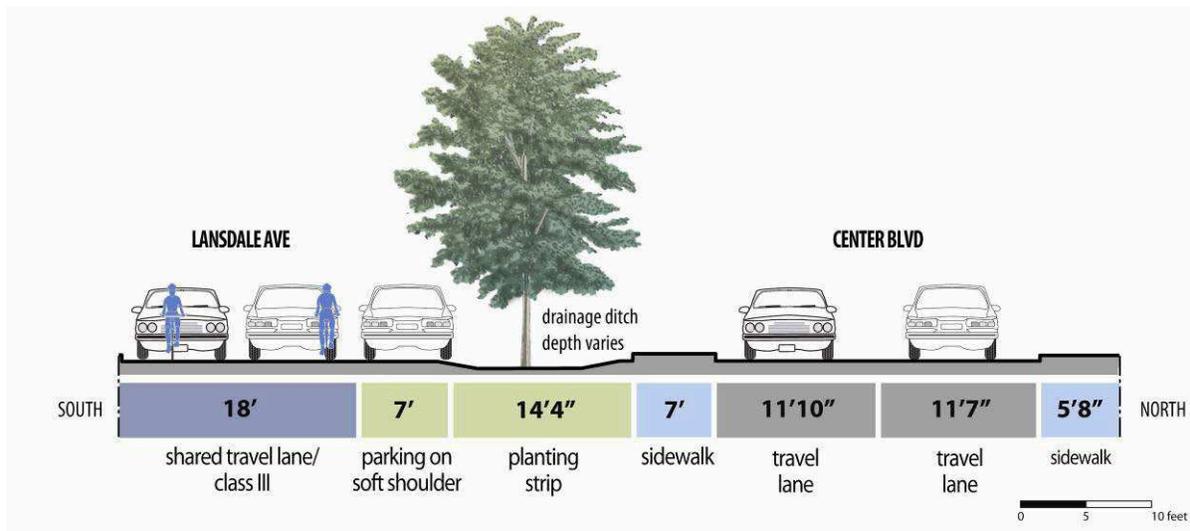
Center Boulevard (Pastori Avenue – Forrest Avenue)
